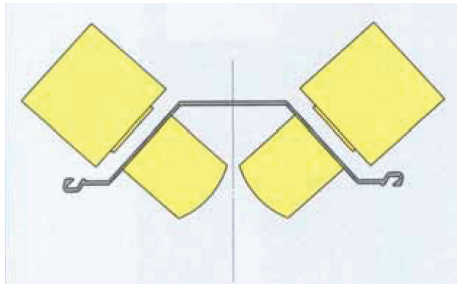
Jacking method of vibratory driving for Hat-Type Sheet Pile 900
